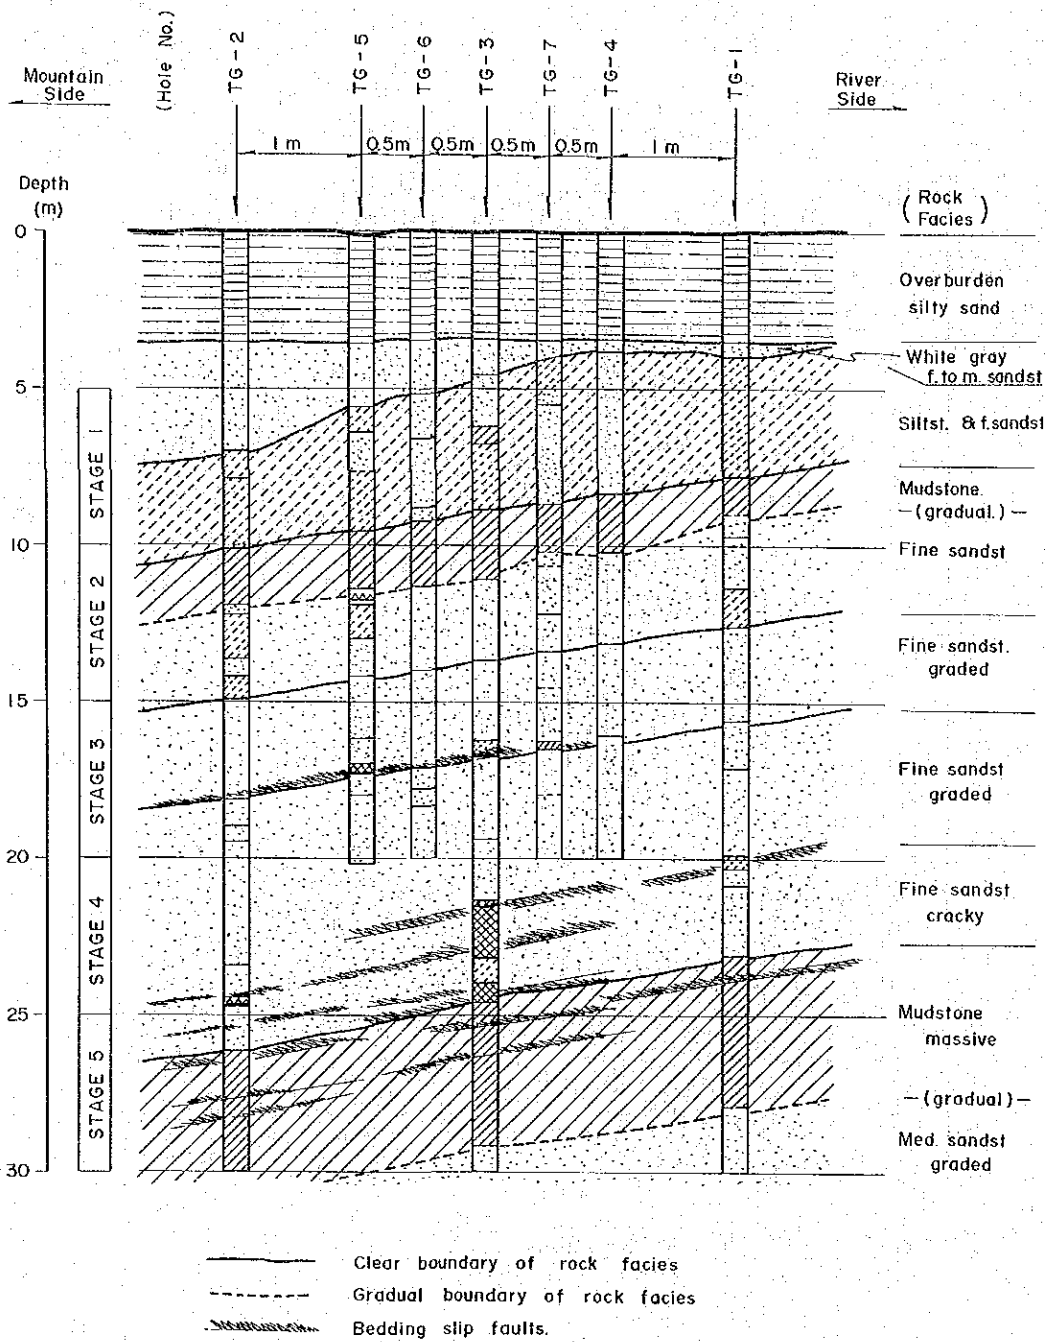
GEOLOGIC SECTION OF THE TEST GROUT SITE
